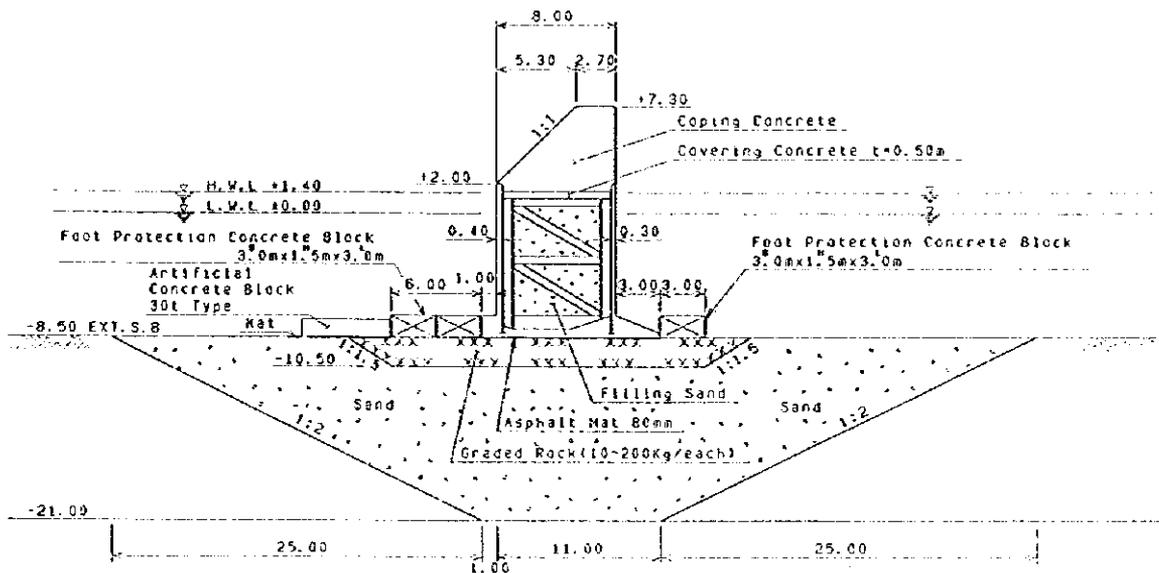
(2) Typical Cross Section of Breakwater (Hybrid Caisson)
